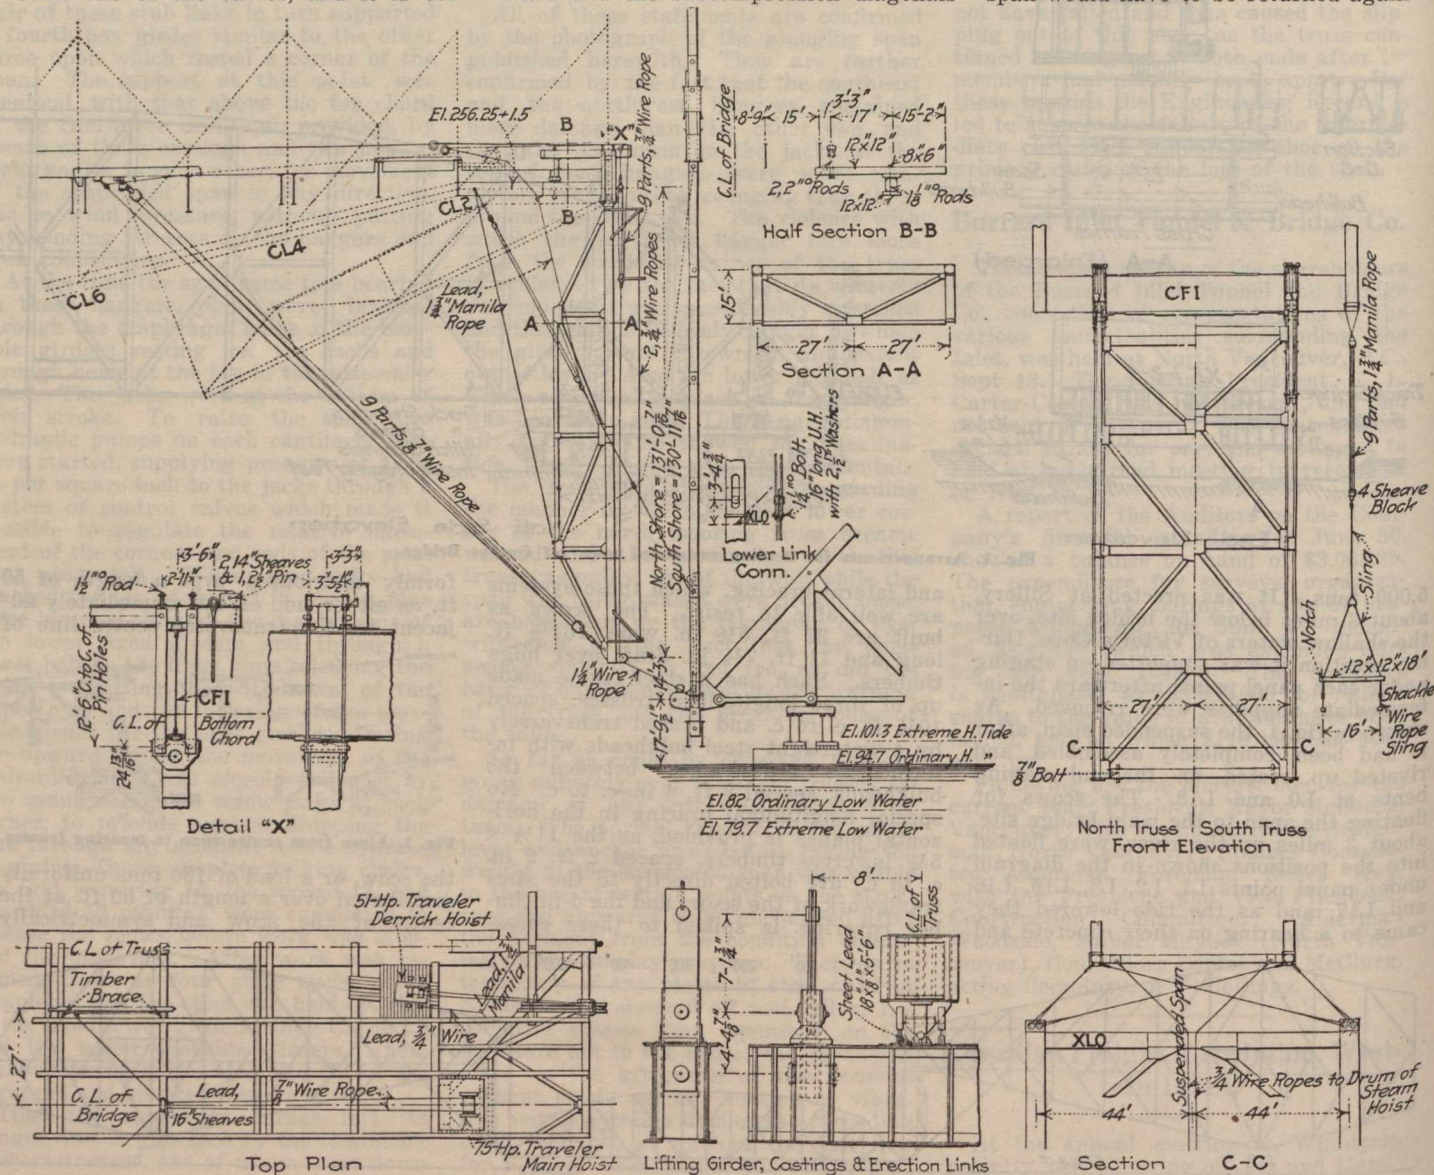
Detail of arrangements for mooring and hoisting suspended span, Quebec Bridge.
